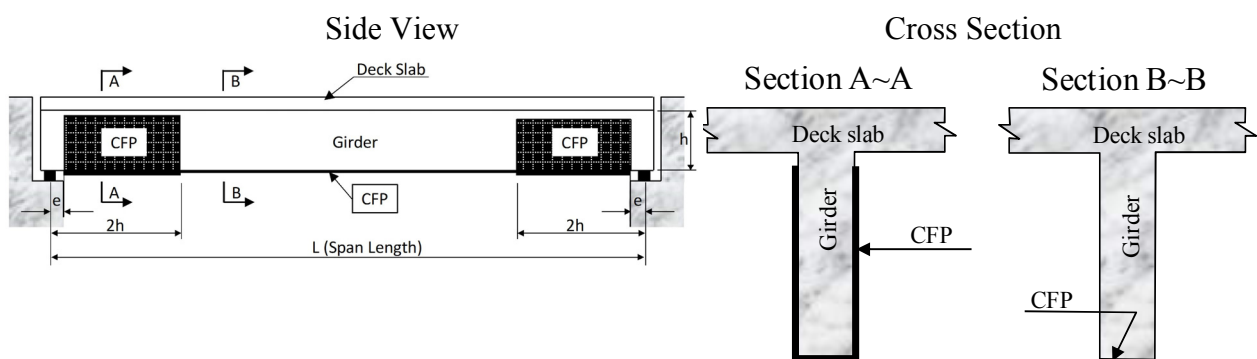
Reinforcing Girder by Carbon Fiber Plate
